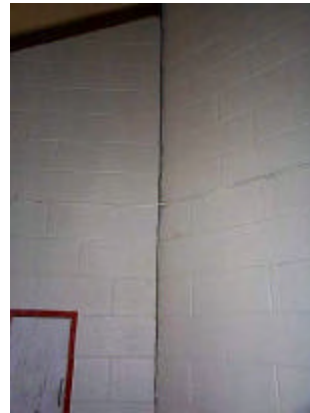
Main Ice Rink – Eastern Wall – Bowed masonry wall.
